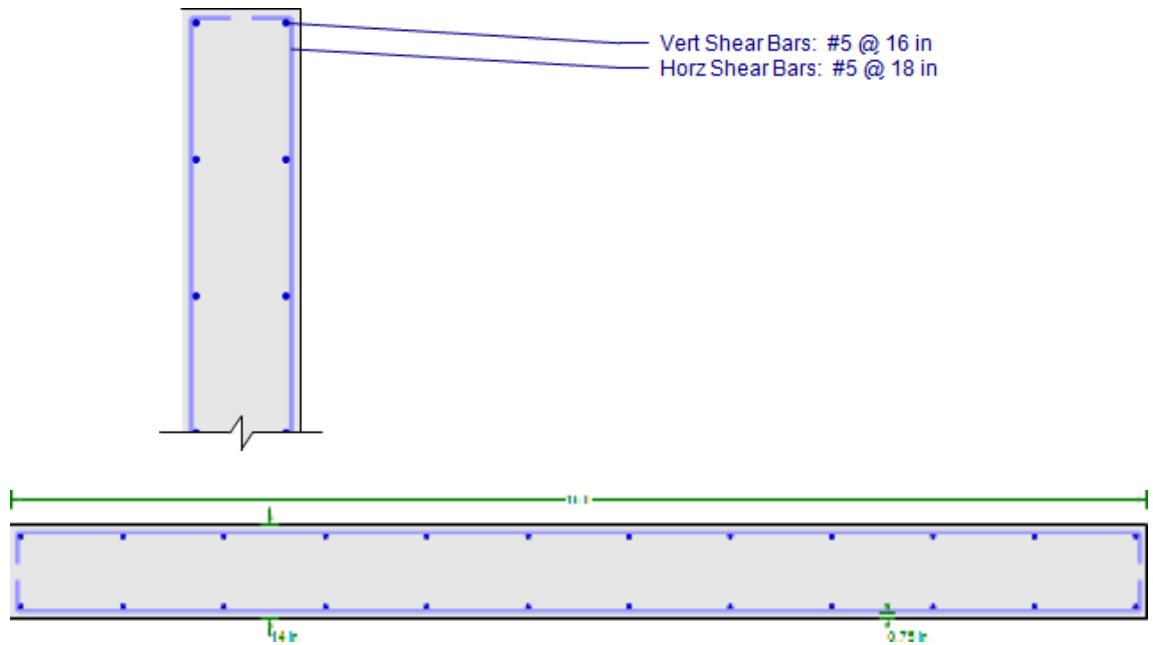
Building (B11-12S-L-S) Special RC Shear Reinforcement Details; Wall Section for Floors 4-6
